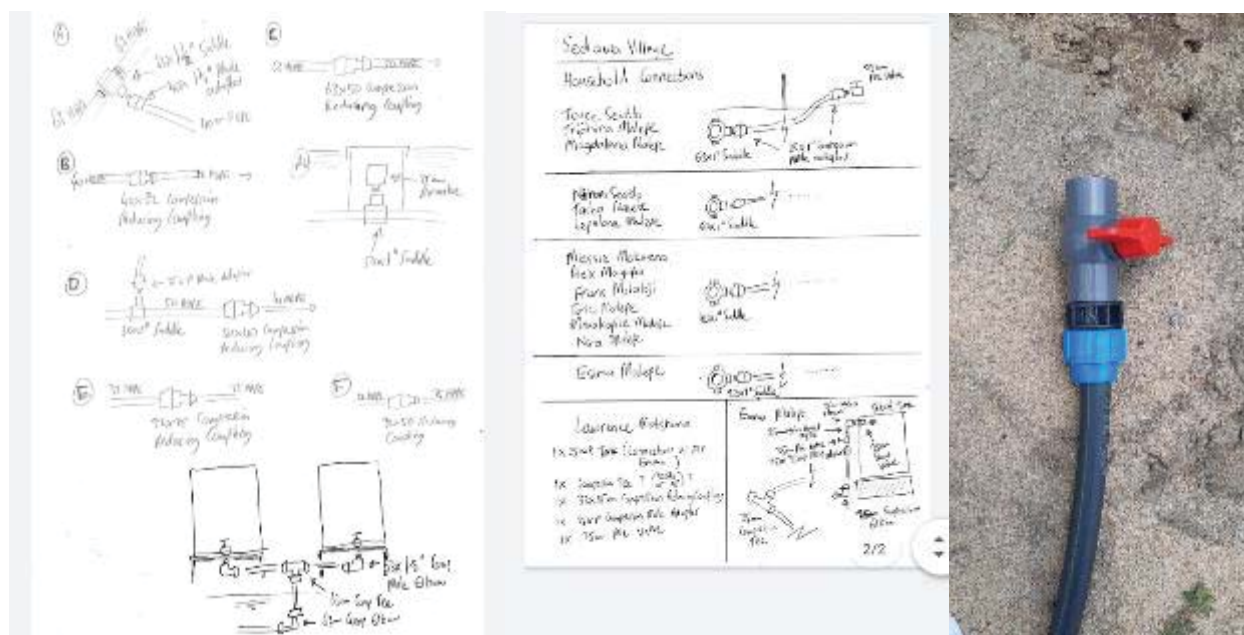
Left and centre; drawings depicting how to install the household connector valve to pipes and tanks and Right; an example of a household connector valve in Sedawa
